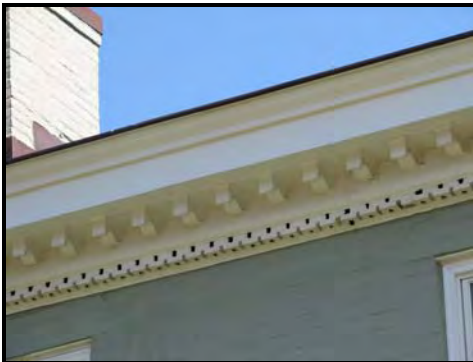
Eave detail should be repaired or replicated using materials to match the original in texture, profile and appearance (404 North Limestone).
